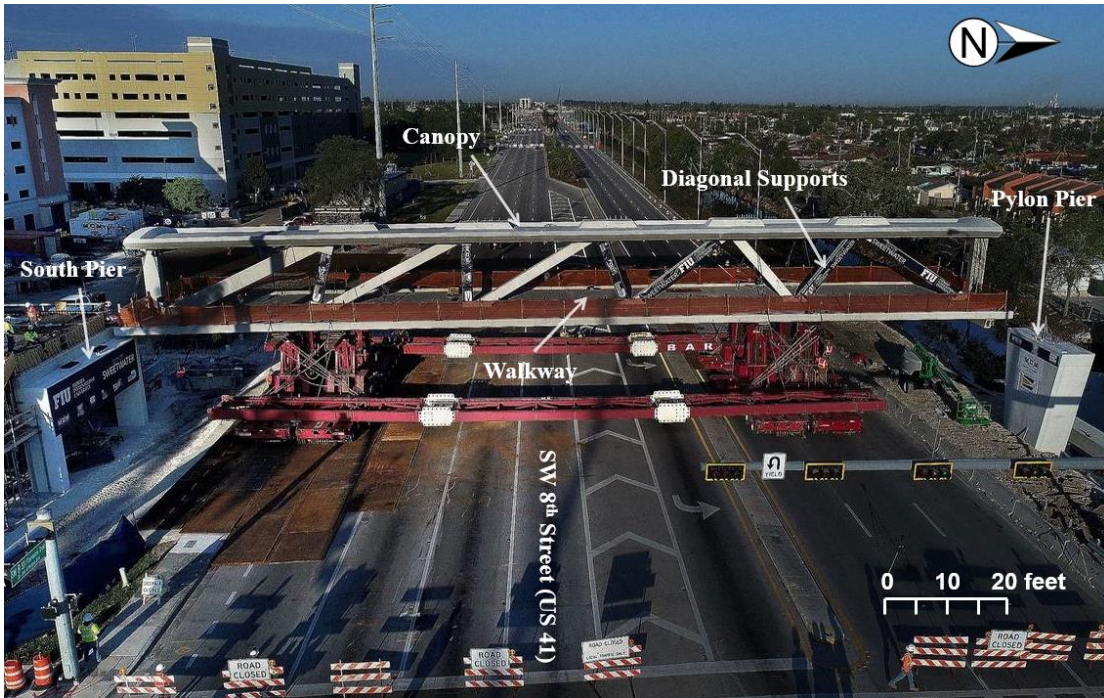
Main span being moved on March 10, 2018 prior to placement on the south pier and pylon pier looking to the west (Source: Miami Herald modified)
